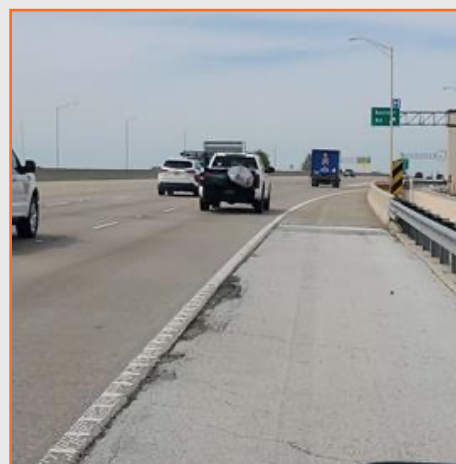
PGBT asphalt shoulder deterioration NBML at Lookout Dr.
